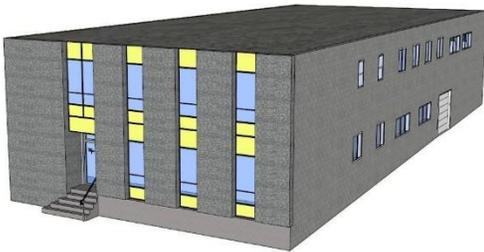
Northwest elevation of the two-storey building from 3D models [34]
